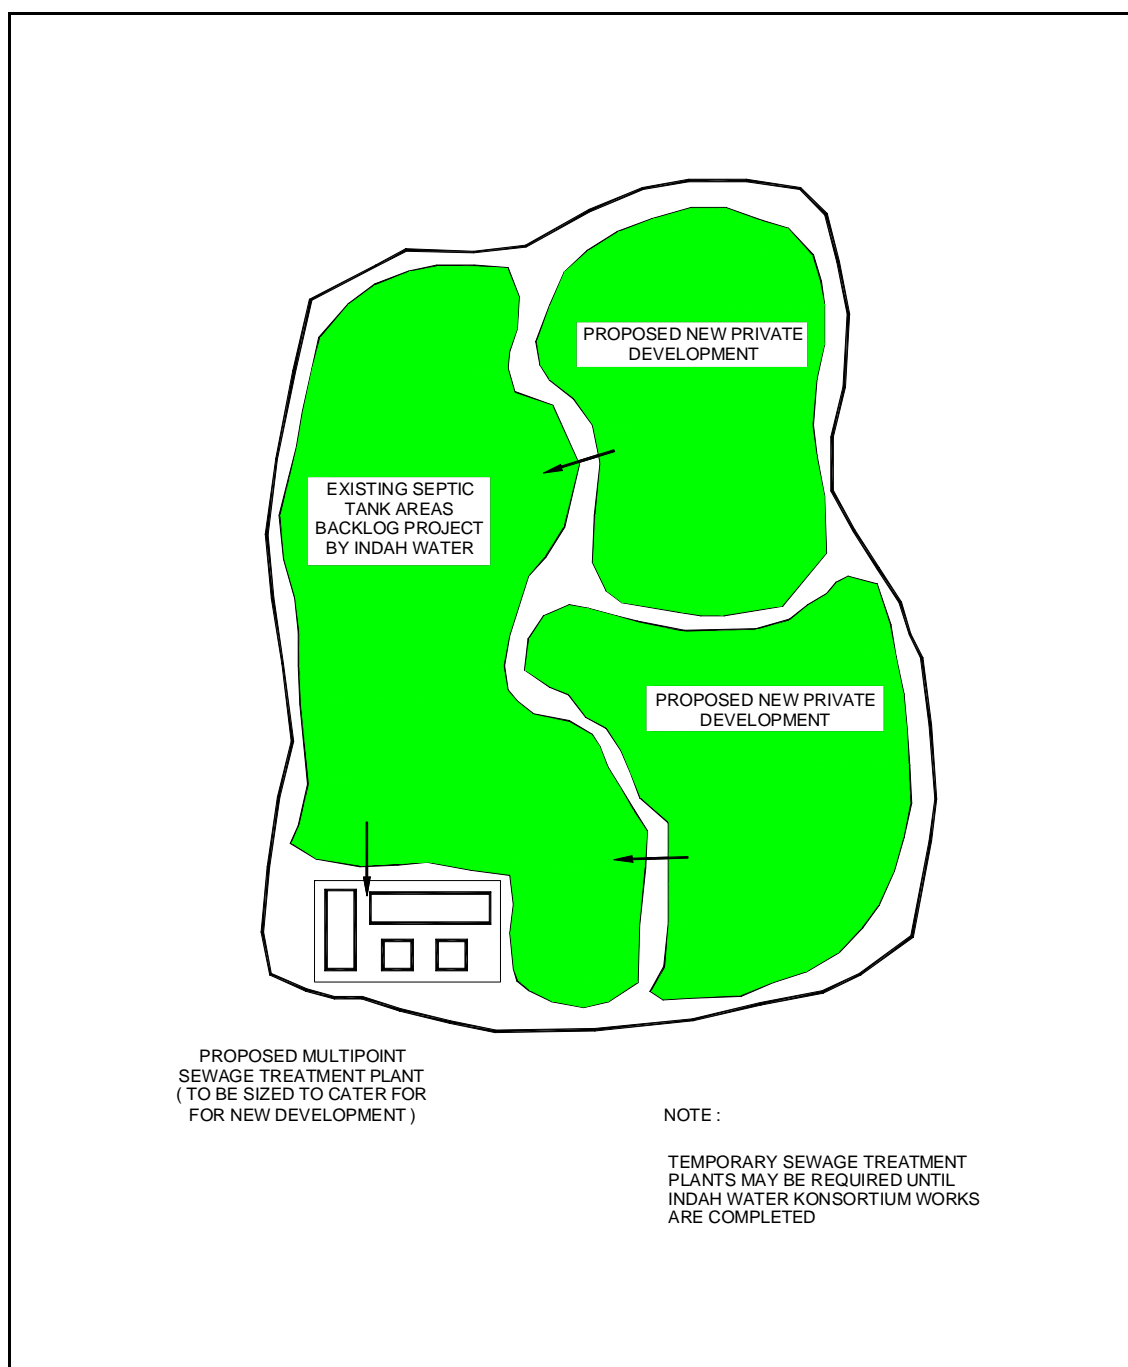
Link-up to Proposed Sewage Treatment Plant Proposed to be Constructed by Indah Water Konsortium
